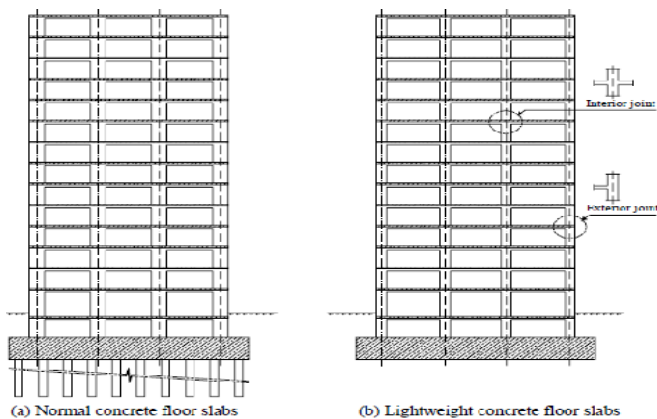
Layout comparison for tall buildings with normal and lightweight concrete floor slabs.
